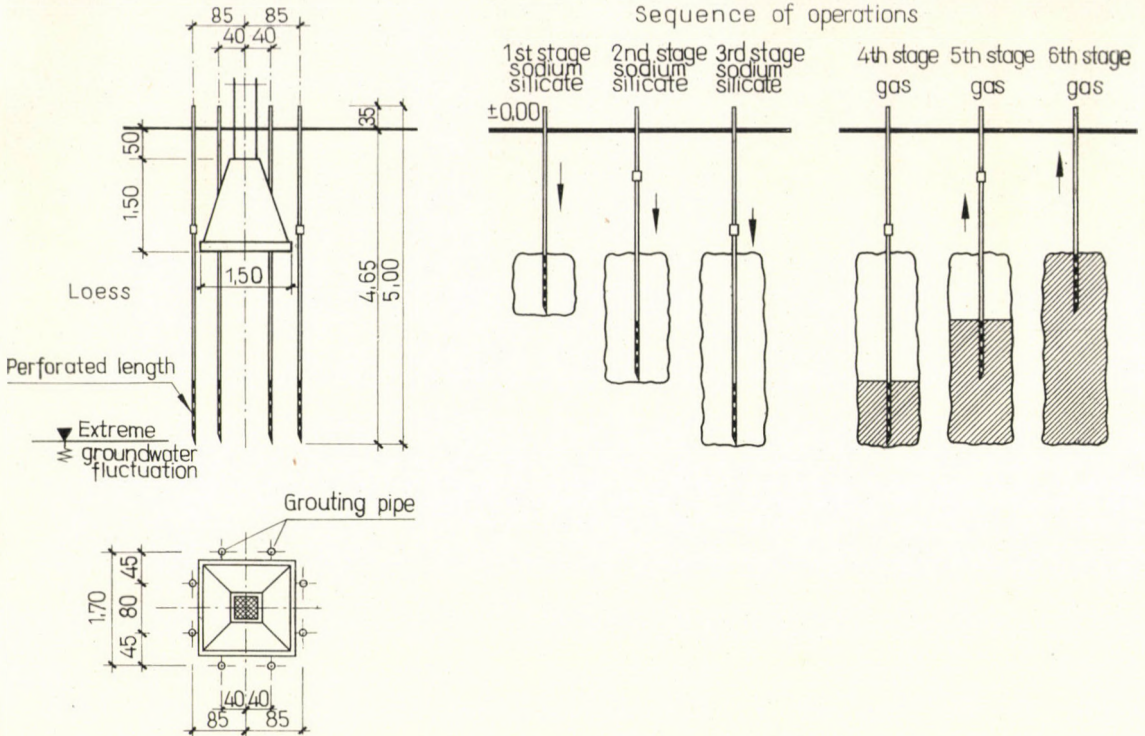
Arrangement of grouting pipes around a column footing and diagram of the stabilization process
